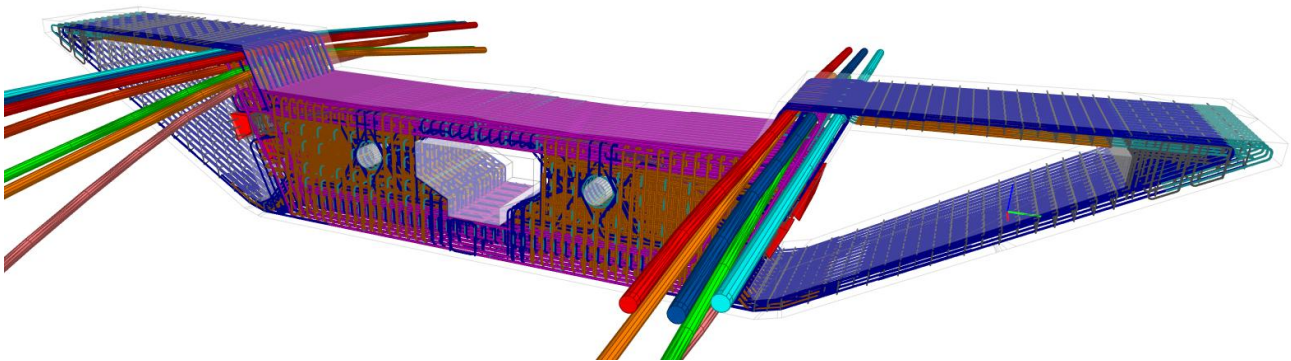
Detailed 3D reinforcement of the diaphragms above P2
